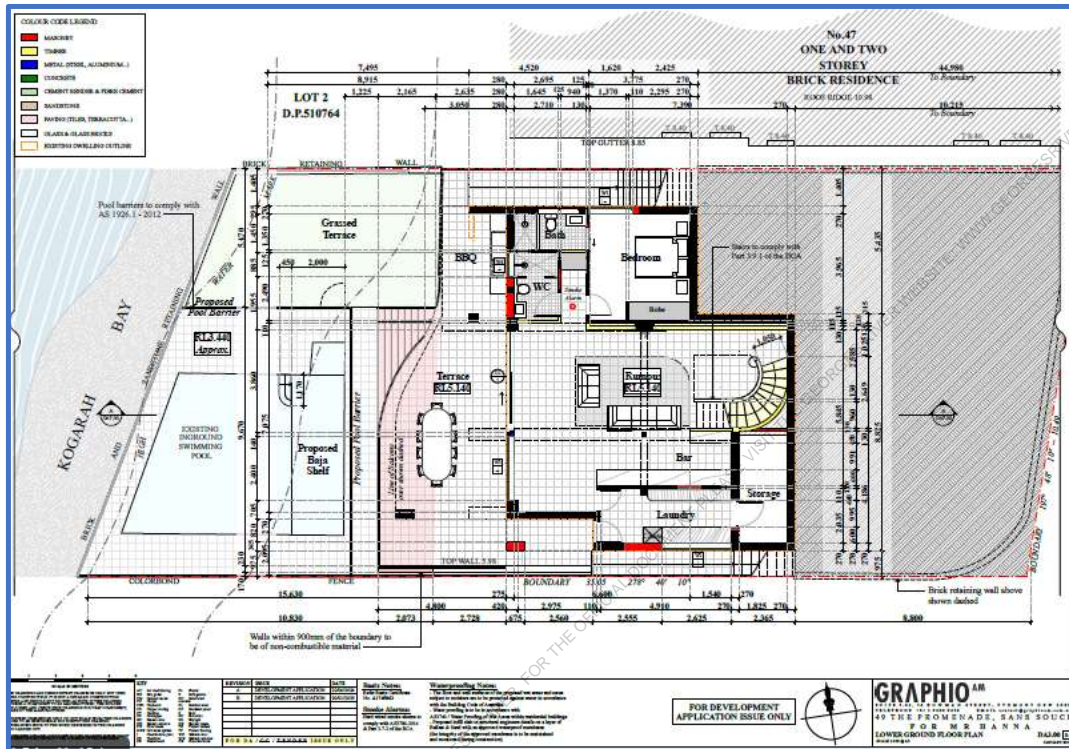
Proposed Baja shelf over existing swimming pool – Lower Ground Level
